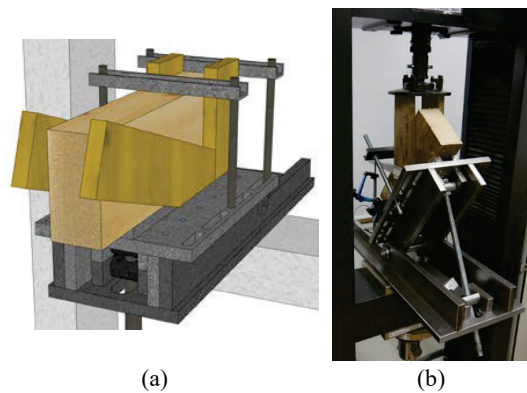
Test set-up for joints (a), isometric view and (b) photo
